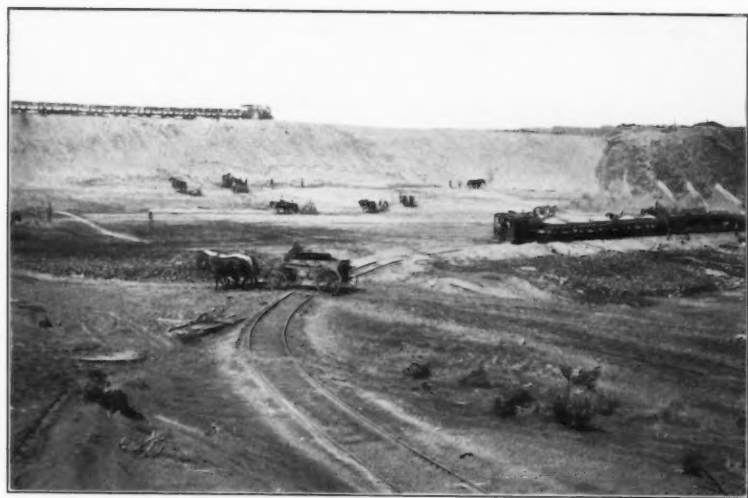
CONSTRUCTION TRESTLE BURIED IN GRAVEL DUMP, COLD SPRINGS DAM.
